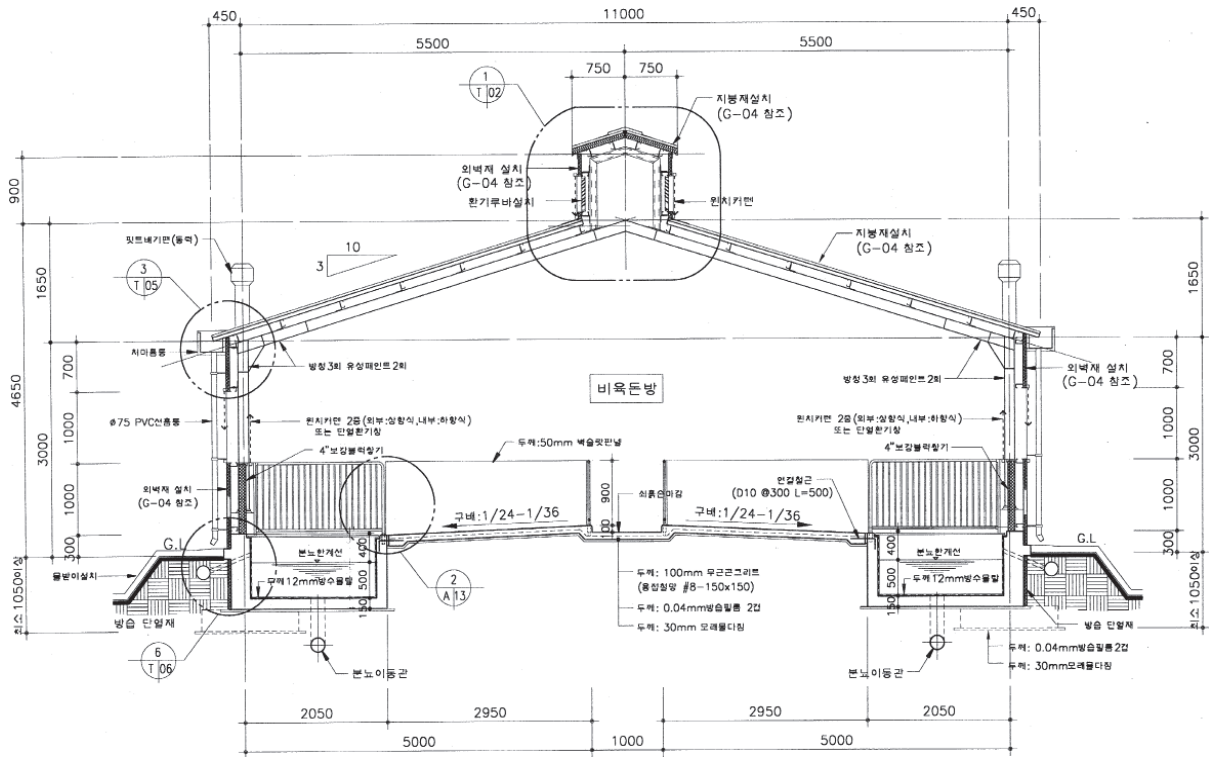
Example drawing of 2<sup>nd</sup> generation design standard with livestock house (MAFRA · NH, 1997, Longitudinal section of fattening pig house)
